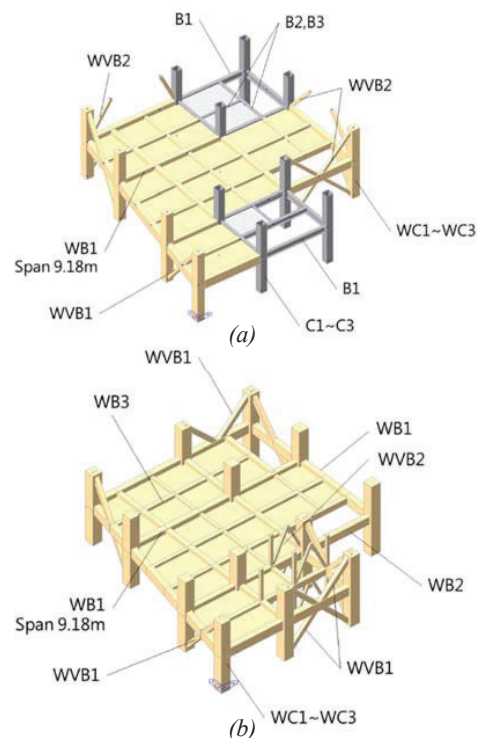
(a) Steel-timber hybrid structure; (b) timber structure.
